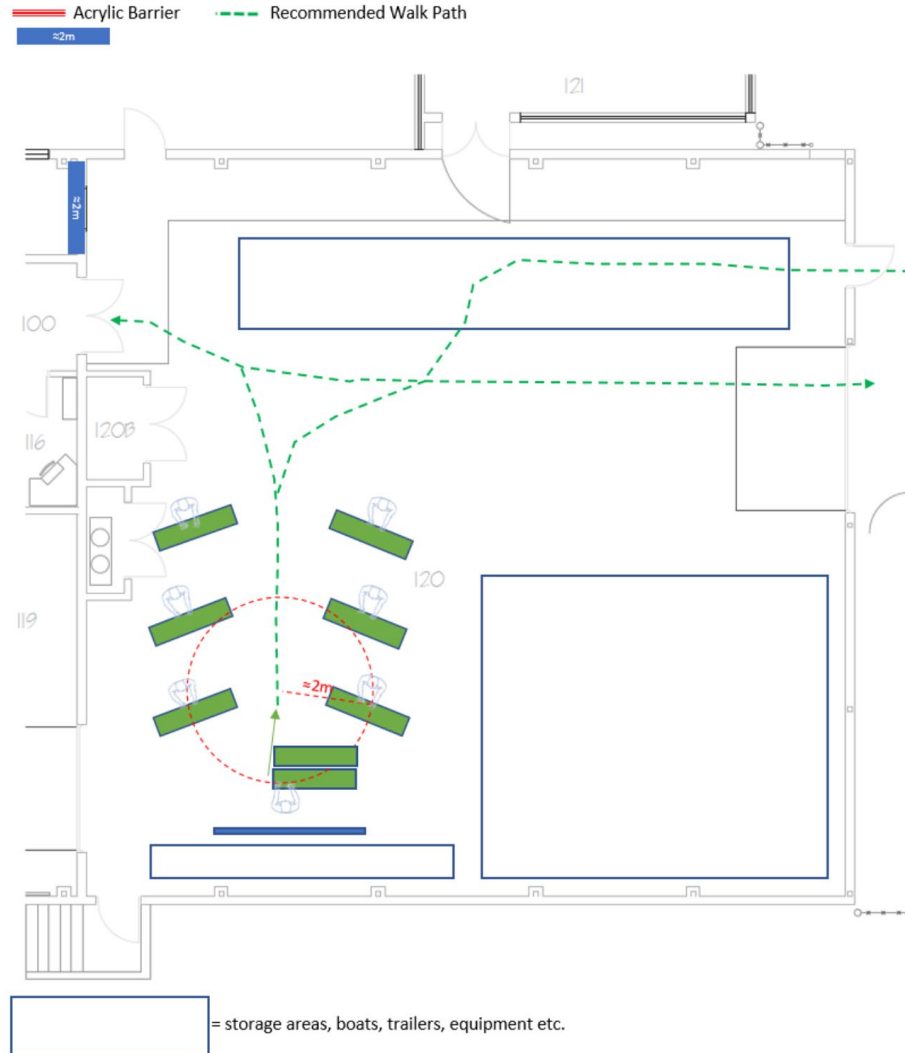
Layout of SE-120 when used for instruction. Green arrows indicate preferred walking routes.
